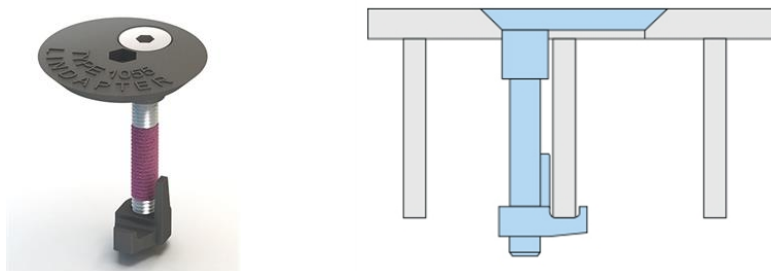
Floor fixing Type 1055 extracted from (Lindapter, 2021)
